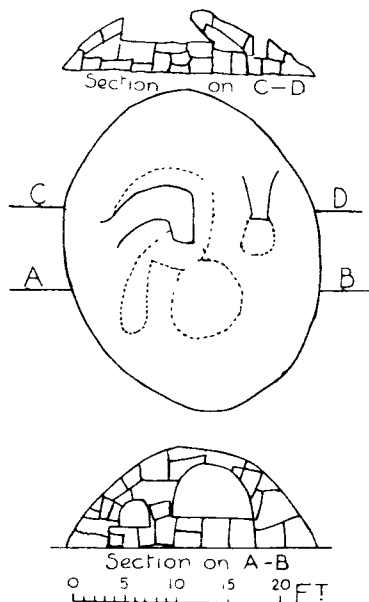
St Kilda: Plan and Sections of the Amazons' House.
